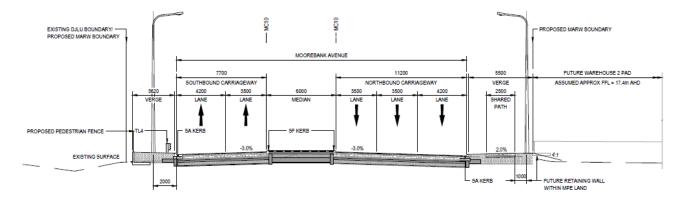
Indicative typical cross-section of alignment near Intersection B
